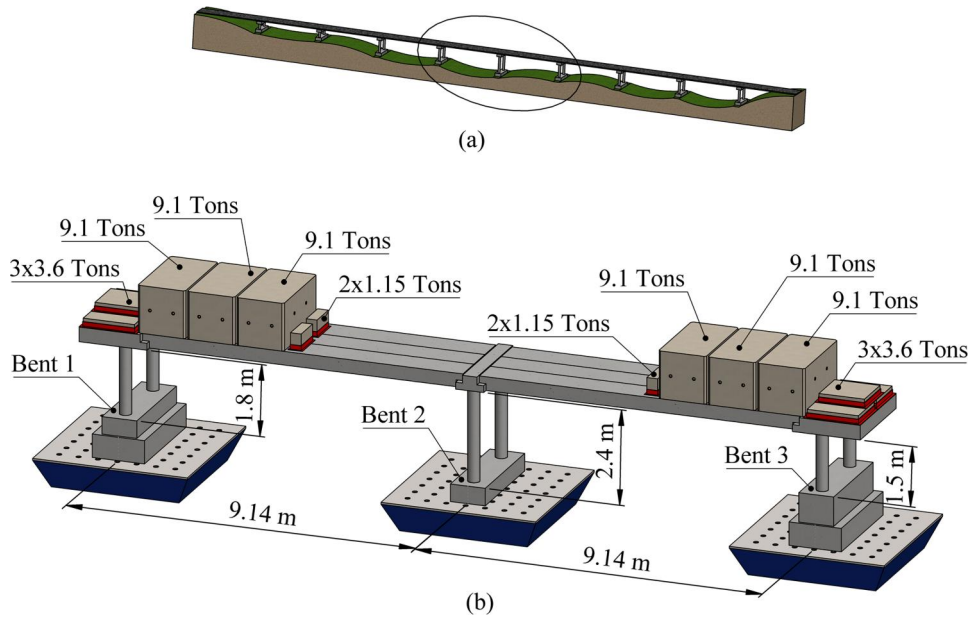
Three-dimensional views of prototype location in a multi-span bridge (a) and the two-span RC bridge specimen tested by Johnson et al. (2008) (b).
